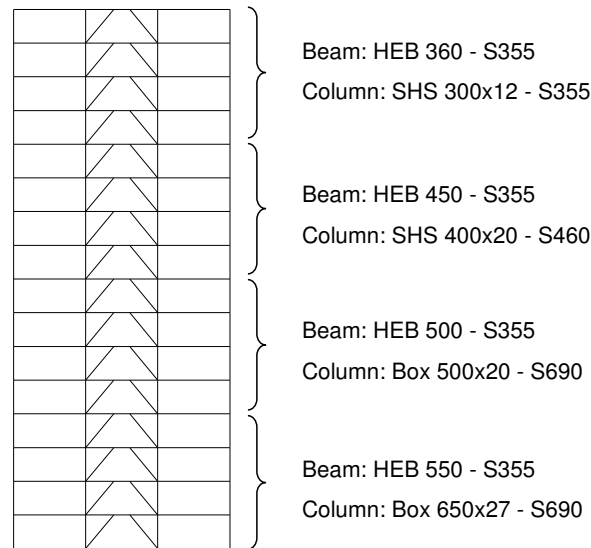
Member cross section of the 16 storey D-EBF designed for soft soil
